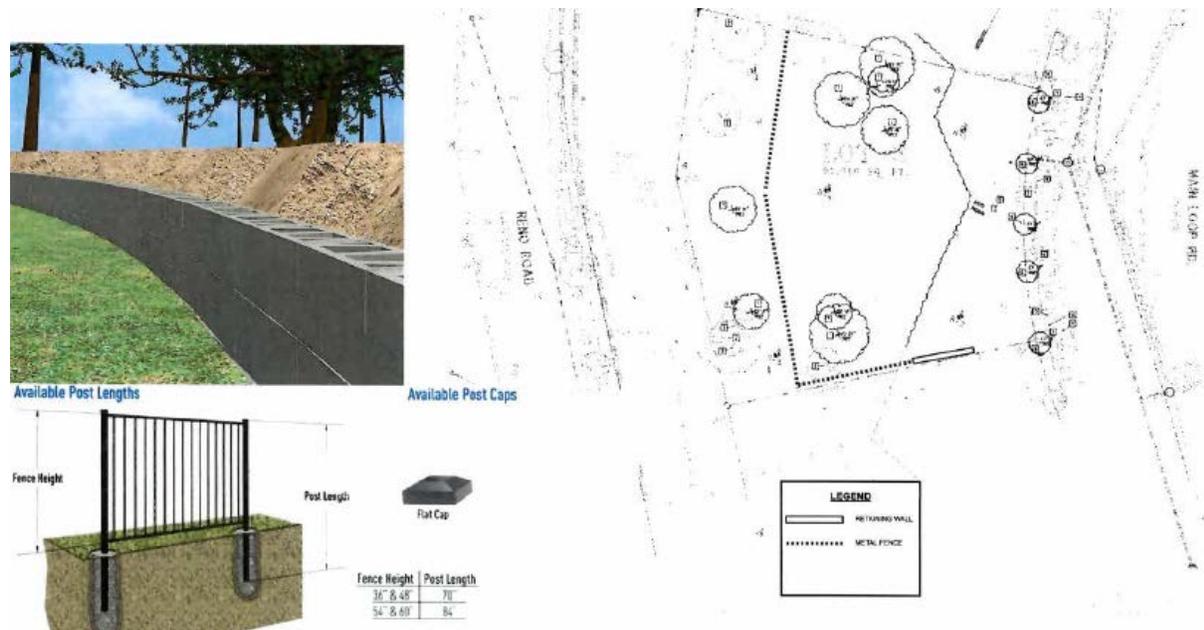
Embassy of Bangladesh Site Plan – Proposed Fence at the rear yard, and retaining wall with fence on top at the east side yard.
